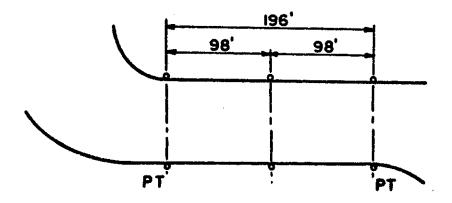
TYPICAL STRAIGHT TAXIWAY SECTIONS - LESS THAN 200 FEET
